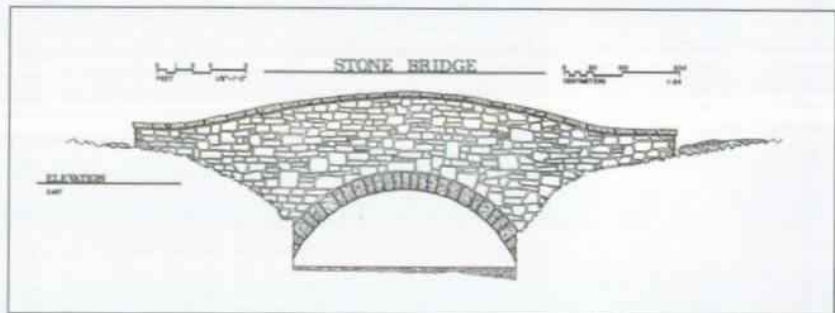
Detail drawing of the stone bridge. HABS, Summer 1989. NCR, Plans and Drawings Collection, #863/80015 (Sheet 18 of 28).
